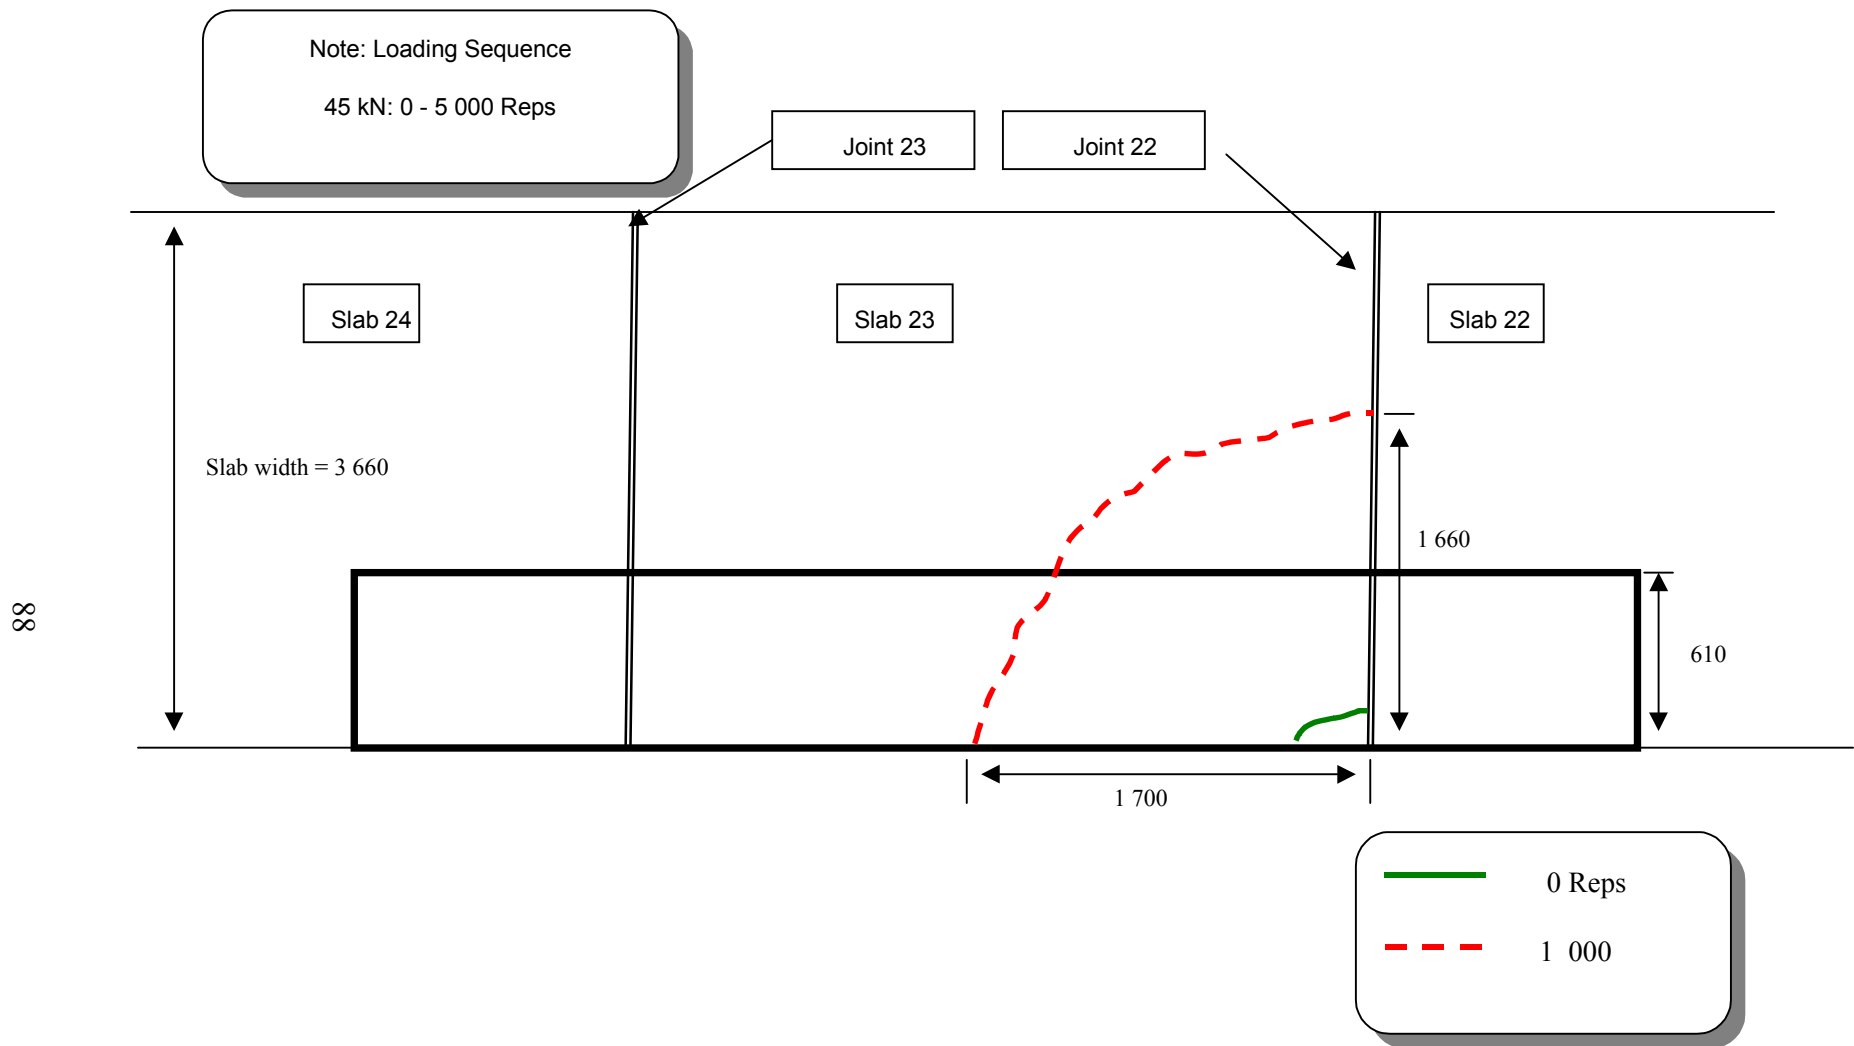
Schematic of crack development, Test Section 525FD (not to scale).
